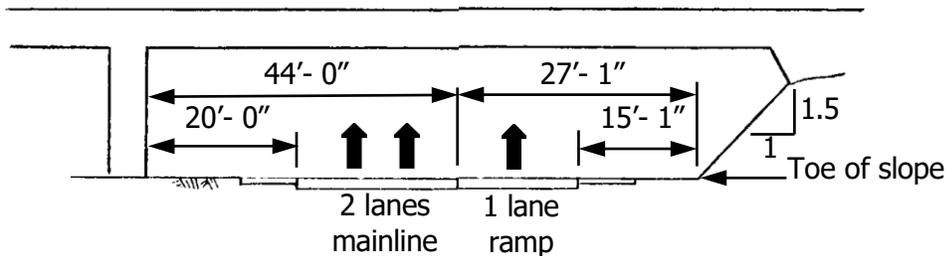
Bridge elevation view of horizontal clearances for a highway feature below the bridge carrying mainline and ramp.
